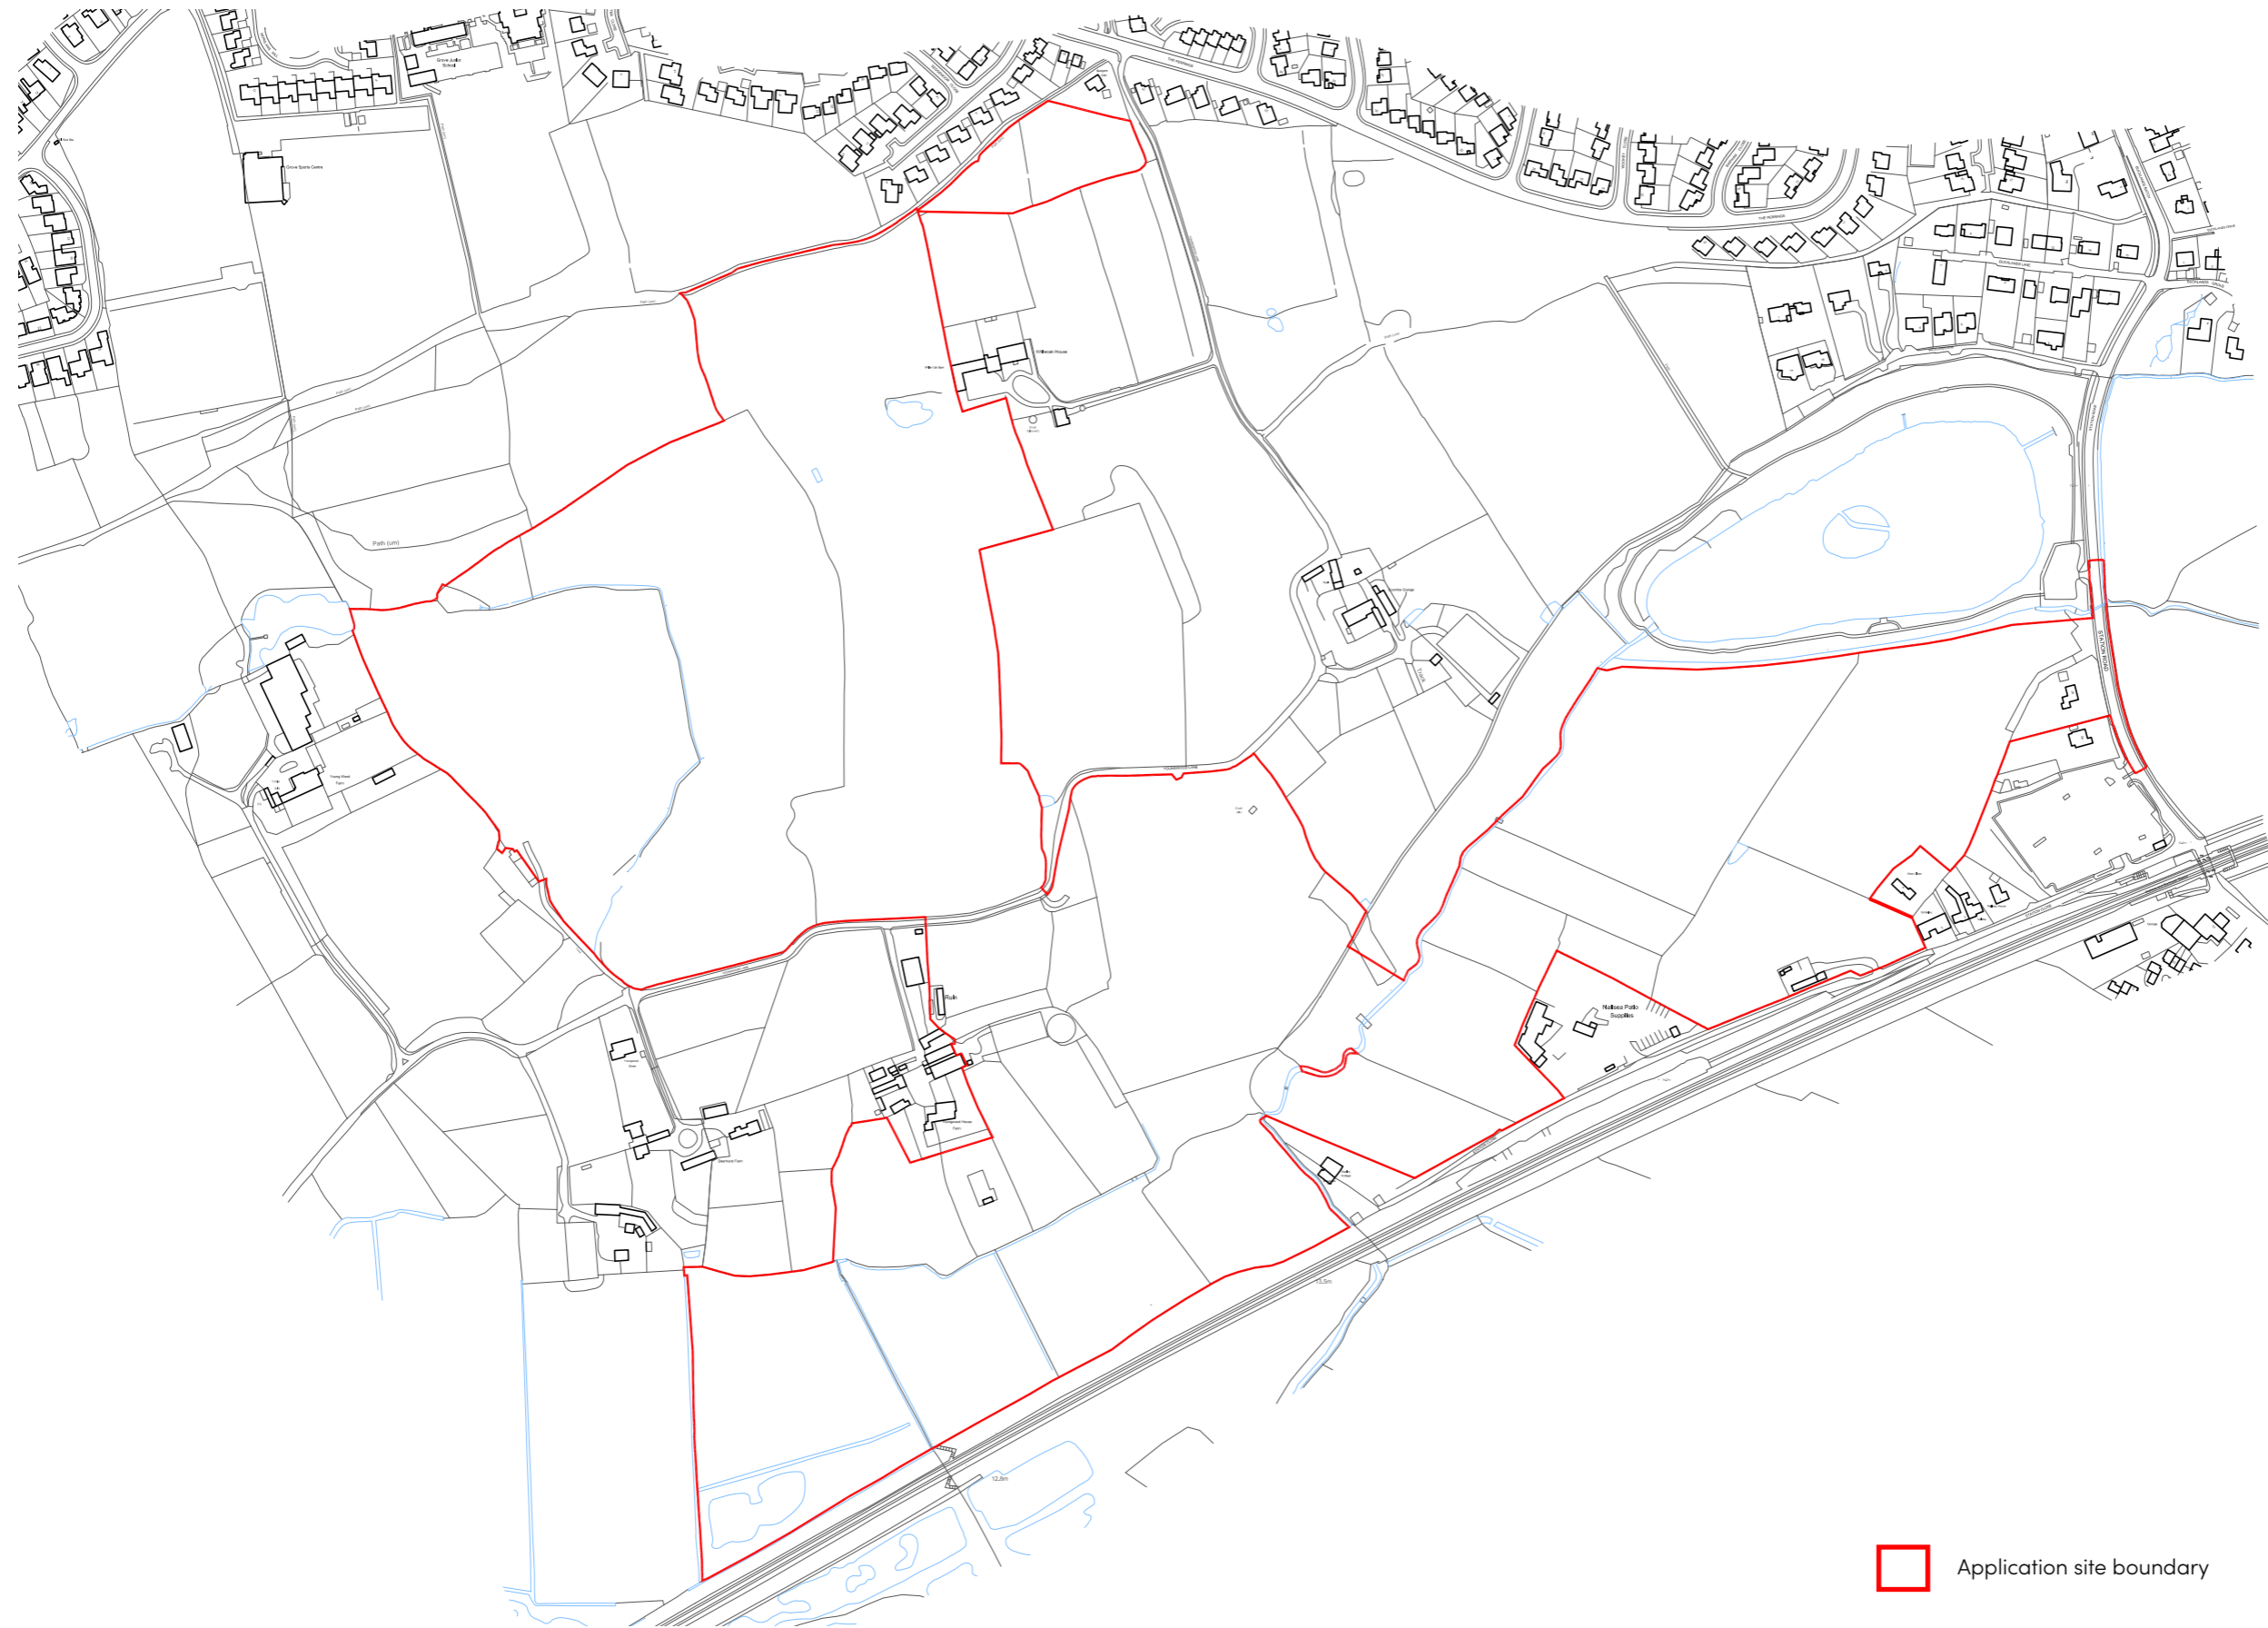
Site Location Plan (Application drawing ref 1223.01)
